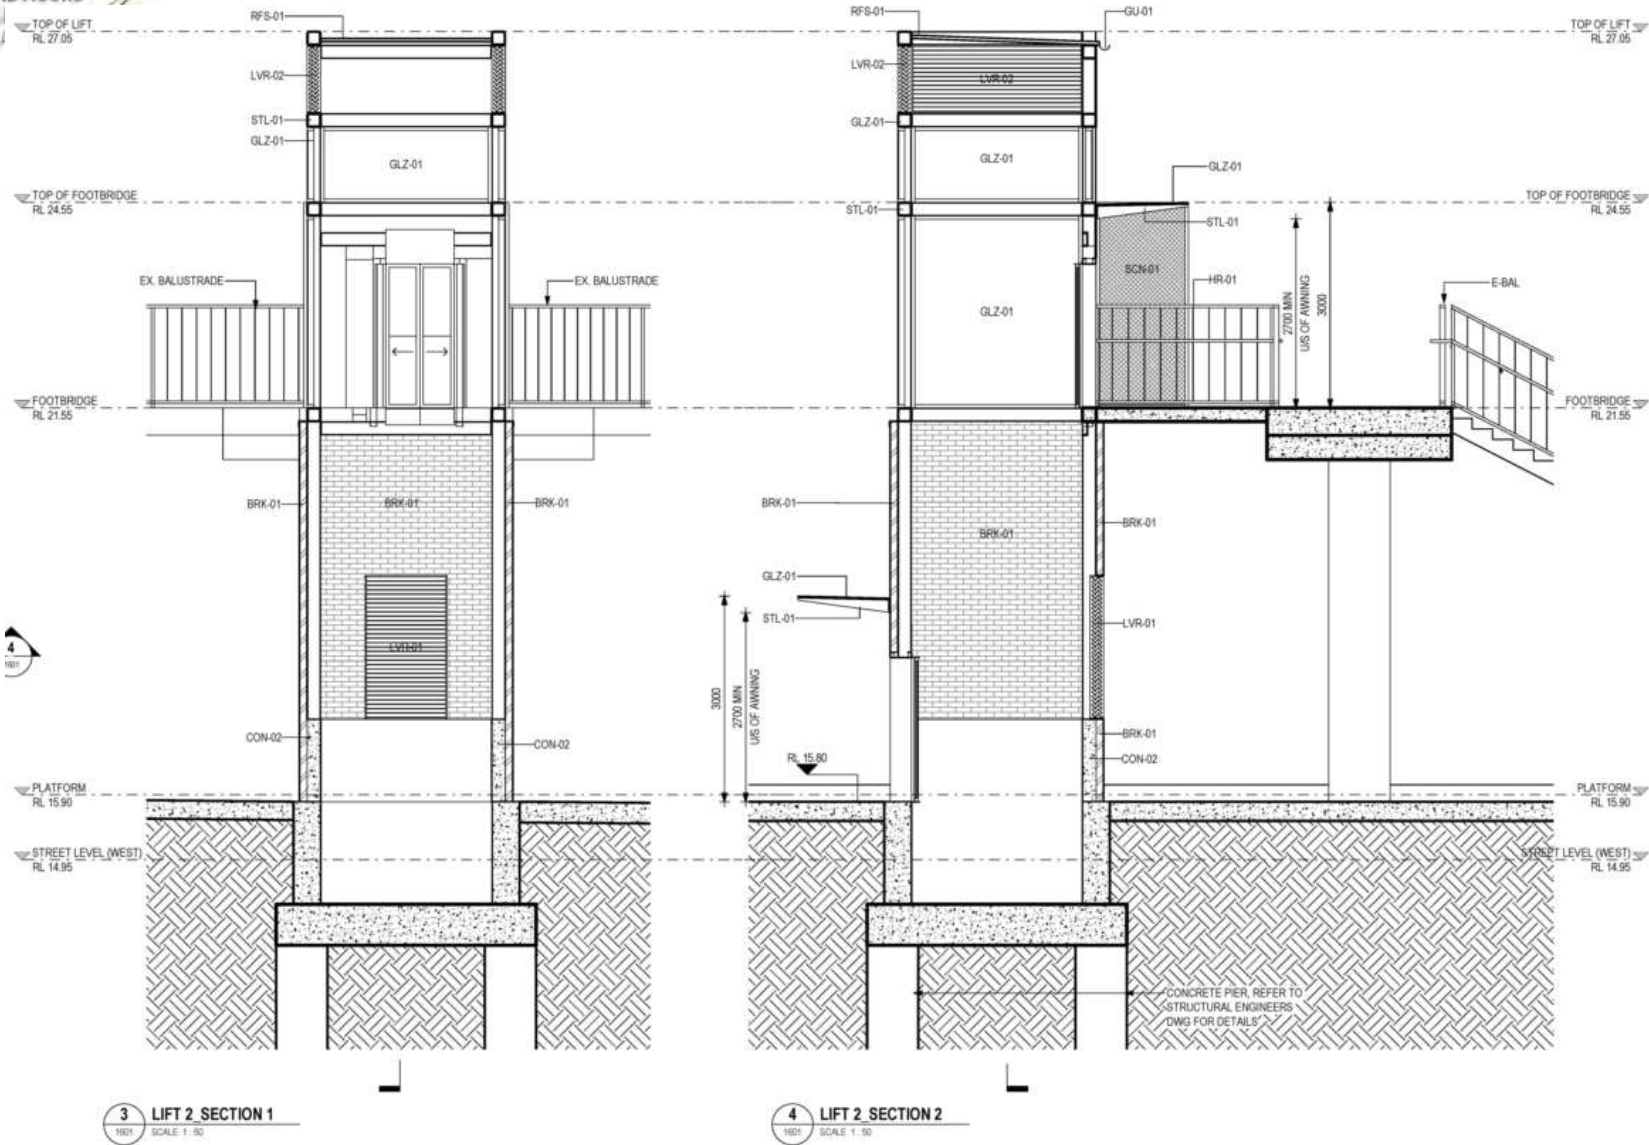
Sections of the Proposed Lift 2 to the Island platform (Lift 3 similar) (Source: Transport for NSW)
